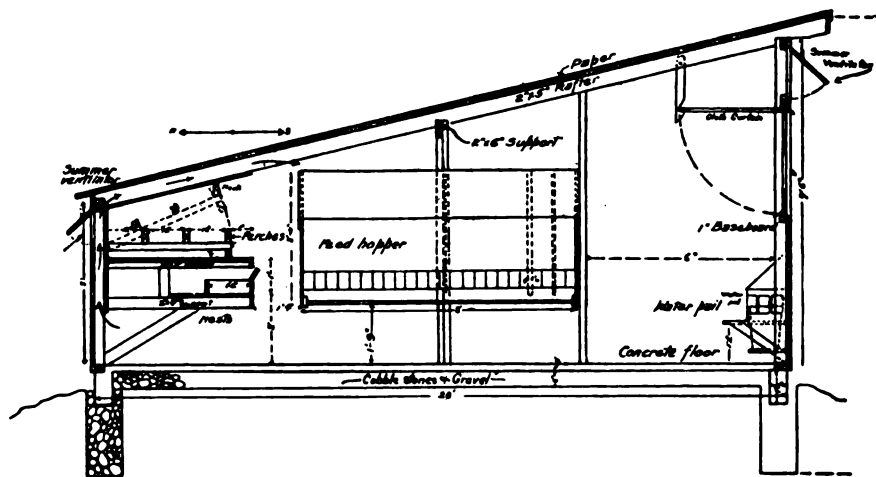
A cross-section plan of a Cornell poultry house with pens 20 feet square. Note that all fixtures are above the floor. Two 12-foot rafters instead of one 21-foot rafter can be used, in which case the ends of the 12-foot rafters would side-lap each other over the center support
